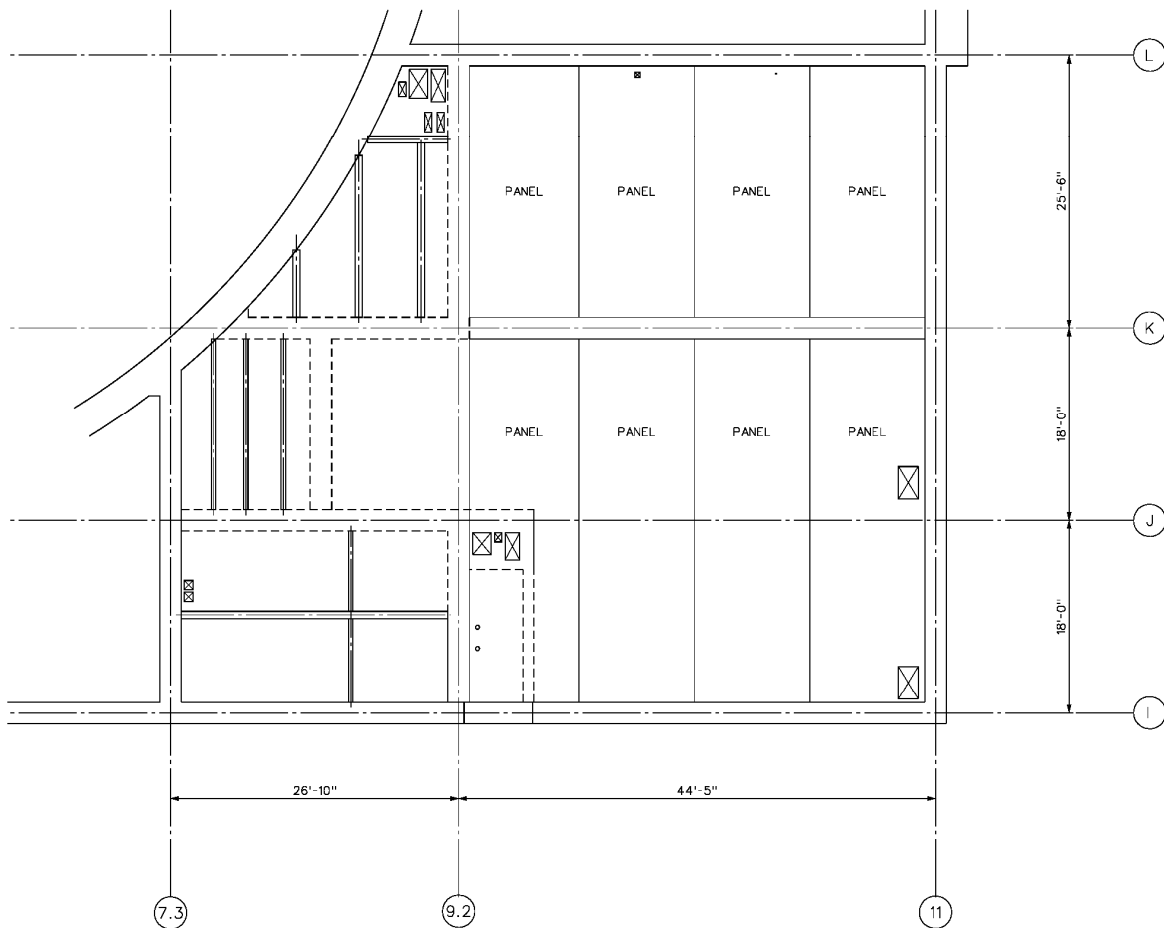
H.5-9 (Sheet 1 of 3) [Auxiliary Building Finned Floor]
